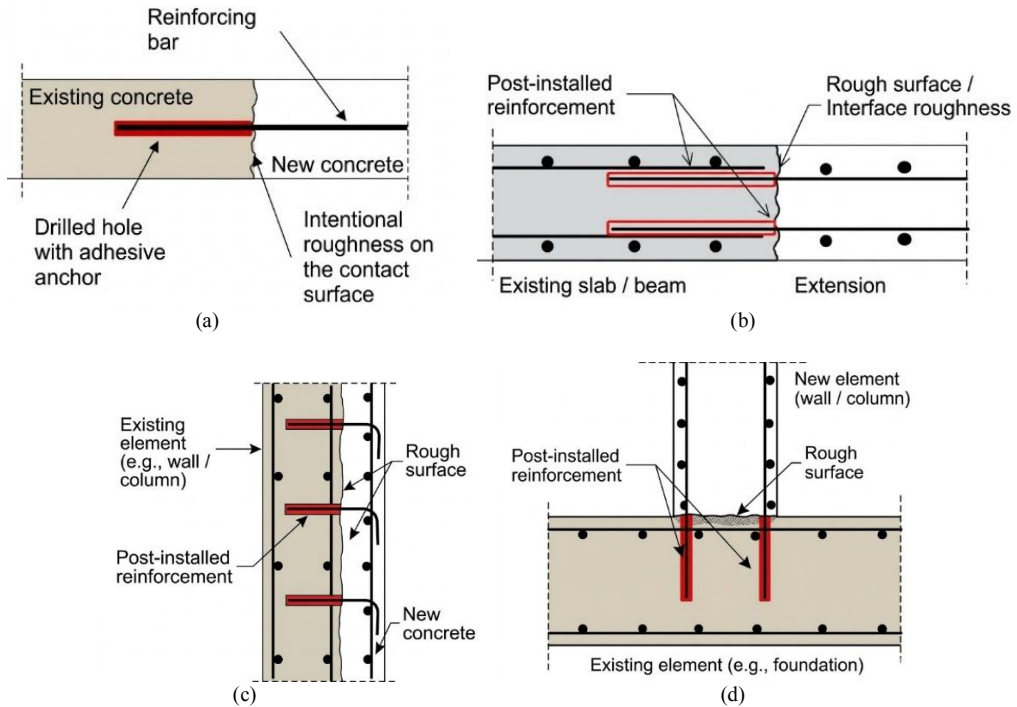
Methods of overlay the reinforced concrete elements: (a) Overlay via adhesive anchor; (b) Overlay overlap; (c) Overlay in thickness; (d) Anchor fasteners
